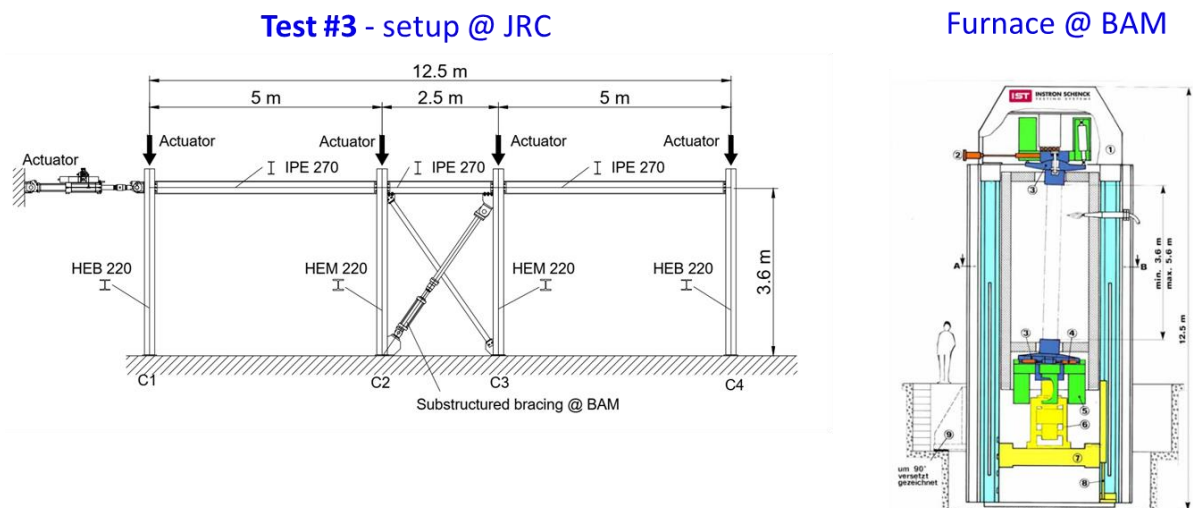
TEST #3: test on post-earthquake fire effects on an unprotected bracing element.
